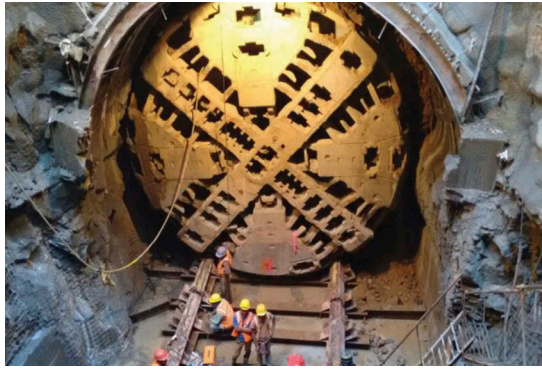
Cutterhead condition when machine was pushed in the shaft.
